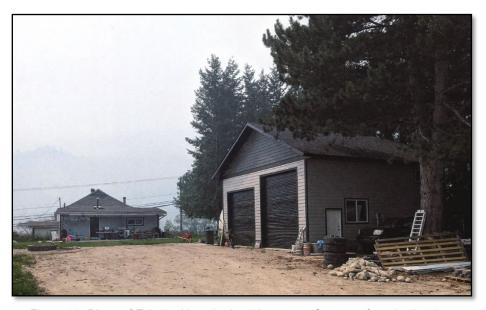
Photo of Existing Unauthorized Accessory Structure from Leckett Lane
